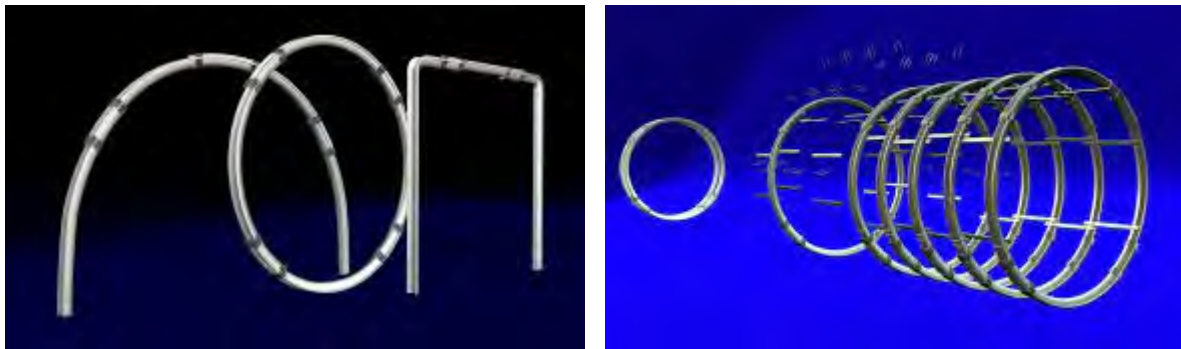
Becker Mining Systems AG - Steel arch support: (left) available shapes, (right) installation example (www.becker-mining.com)
